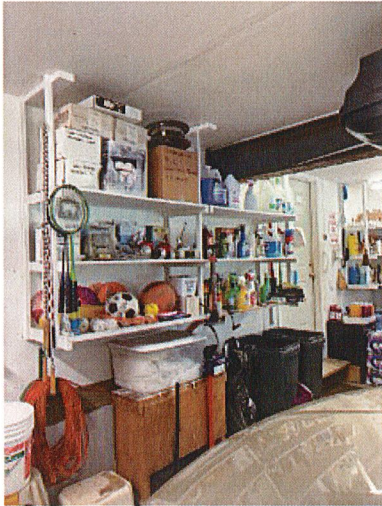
Plywood is present on the wall surface between the garage and living space.
